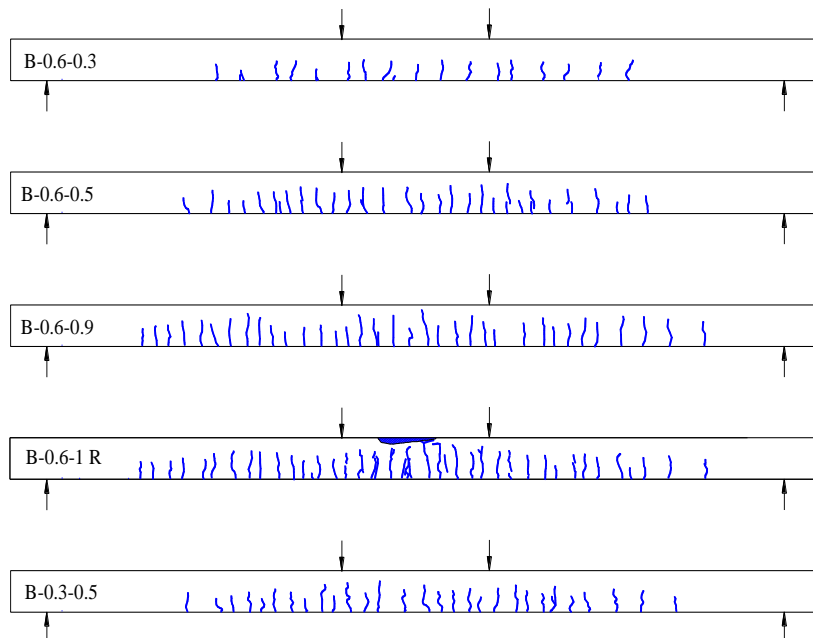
Crack patterns of the damaged beams due to preloading and before strengthening.
